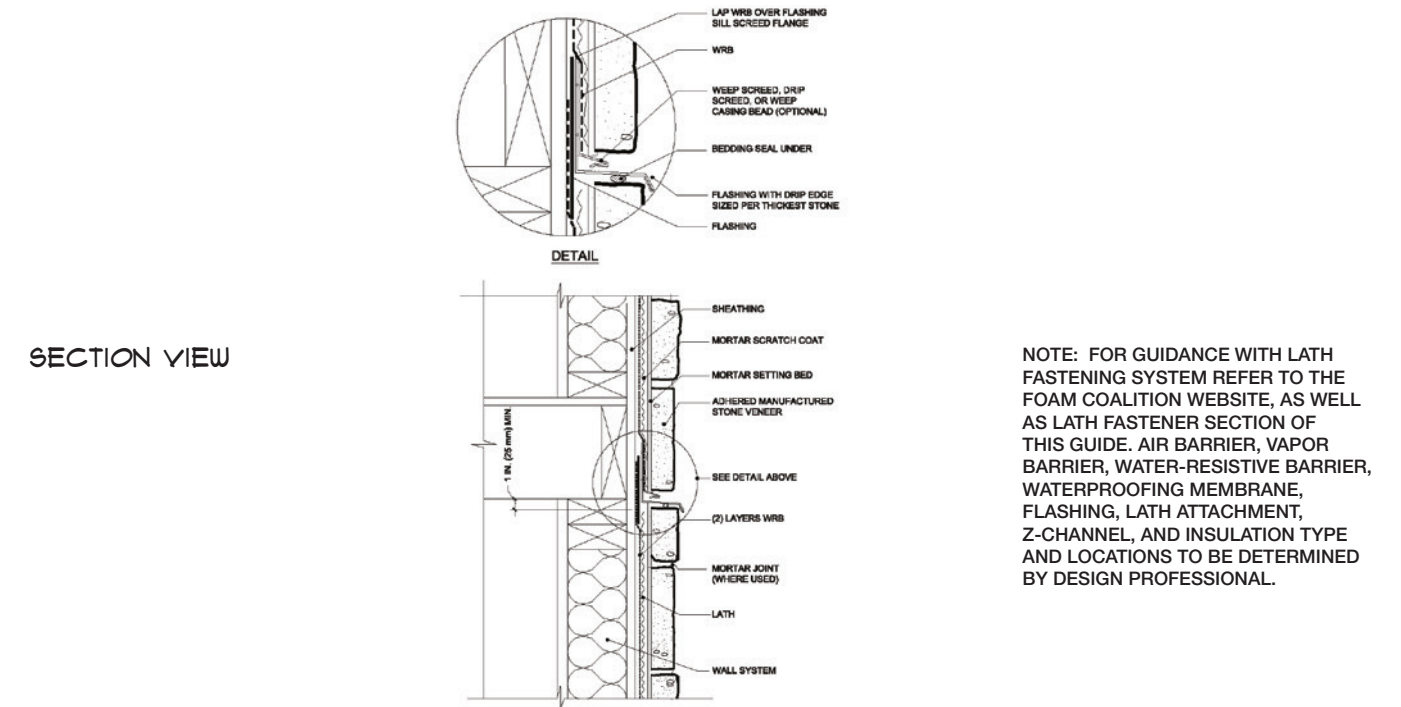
WALL-SECTION MULTI-FLOOR JOINT DETAIL
